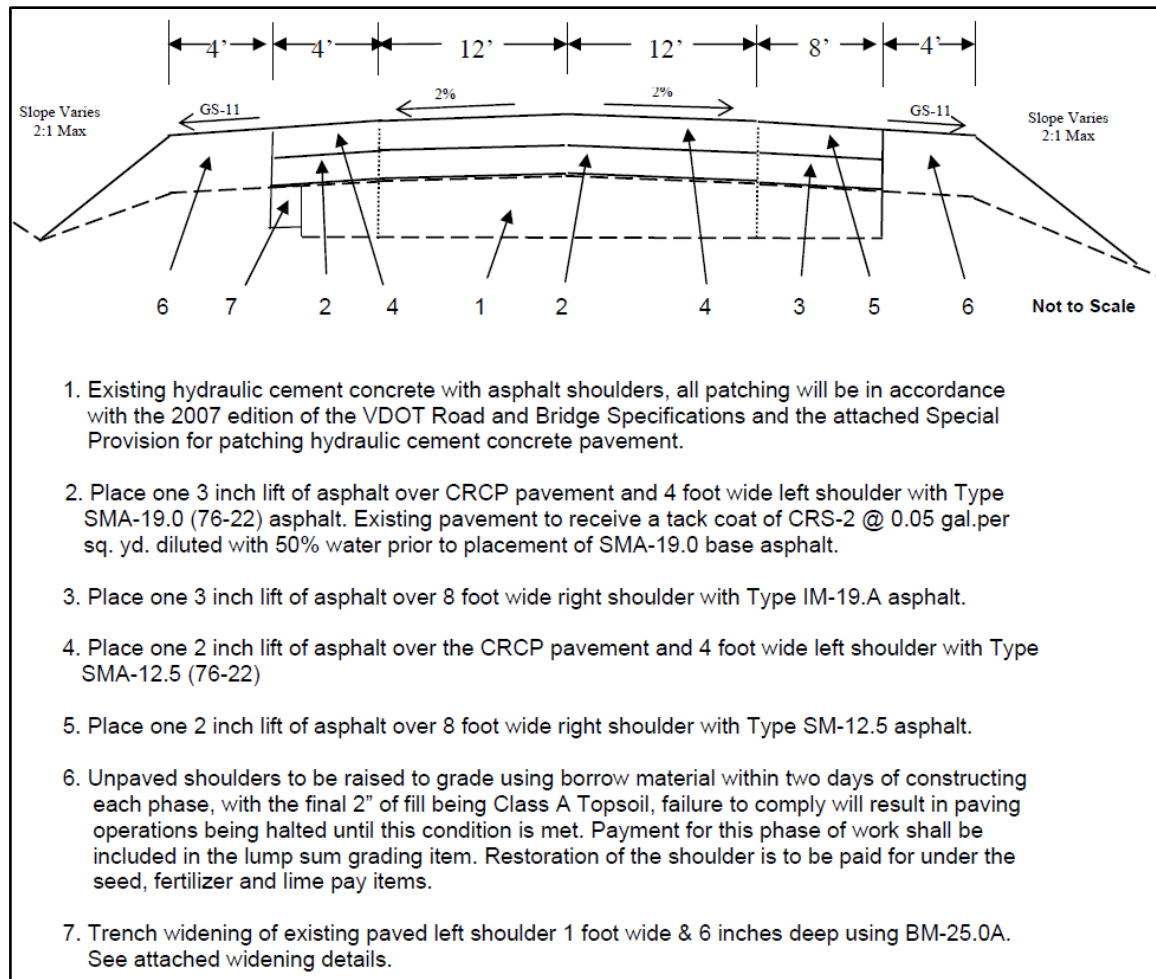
Typical Section for Asphalt Overlay (VDOT contract document UPC 98787, 2011). CRCP = continuously reinforced concrete pavement; SMA = stone matrix asphalt.
